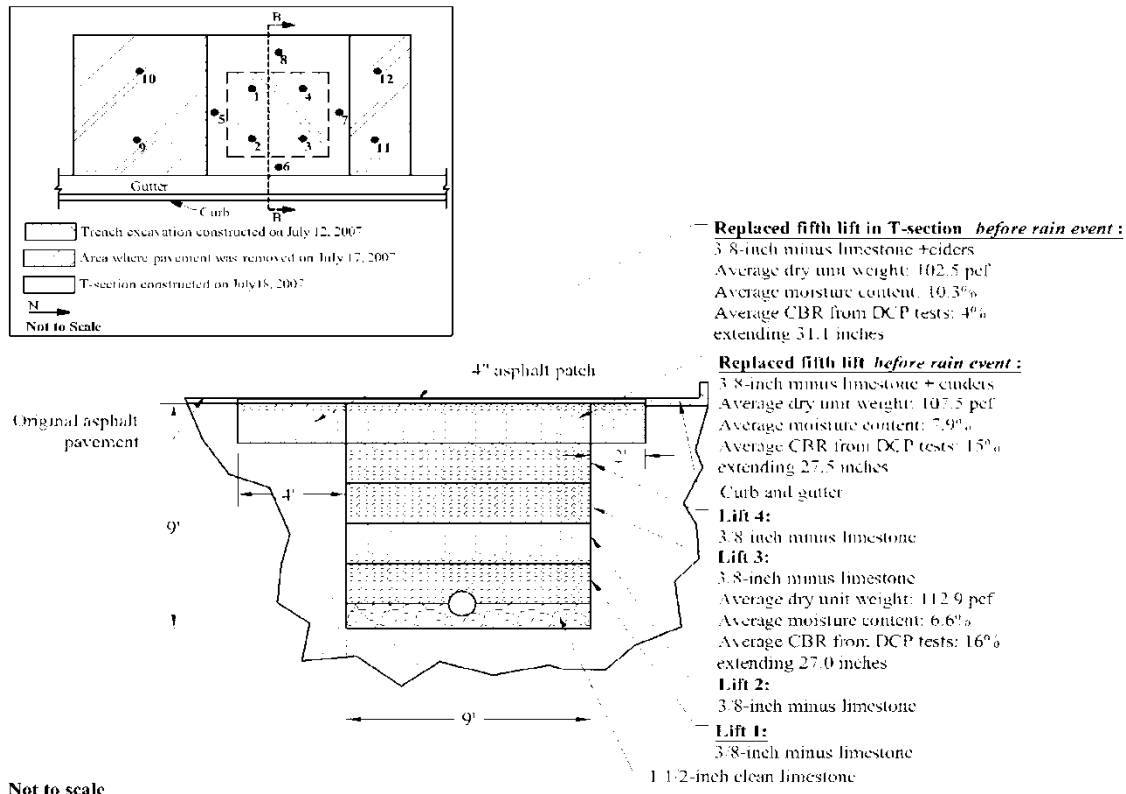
East-west cross-section of completed Trench B on July 18, 2007; (a) plan view, (b) cross-section
